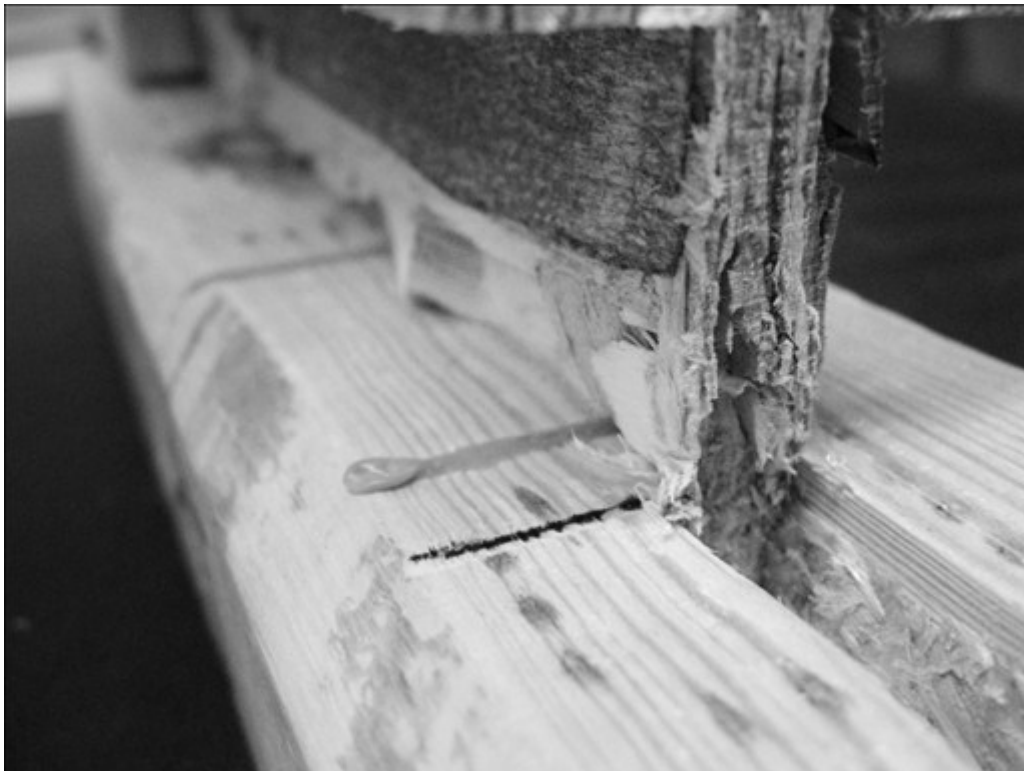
OSB web-to-flange joint test specimen damaged in the web.
